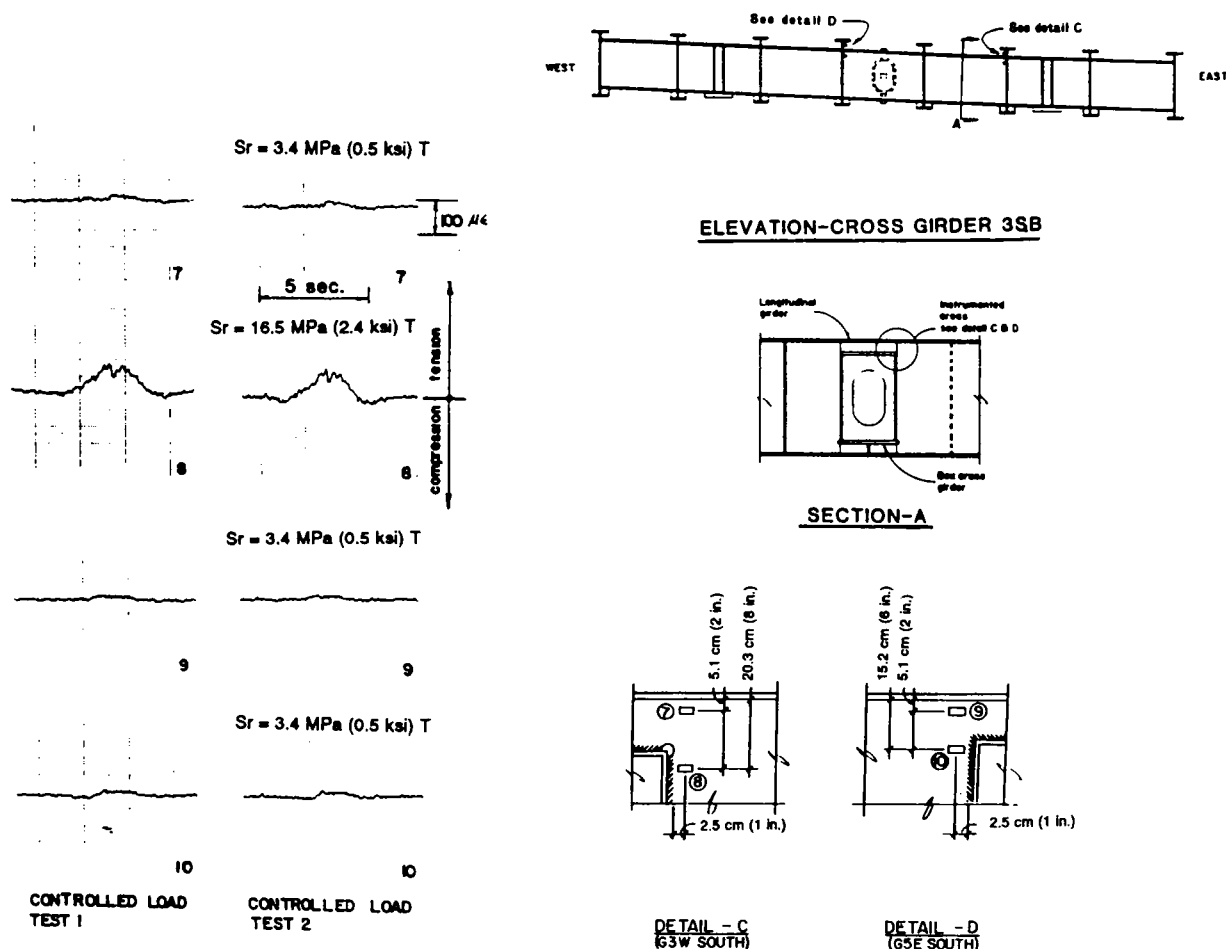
Representative strain response adjacent cracked girder to cross-girder connections.
